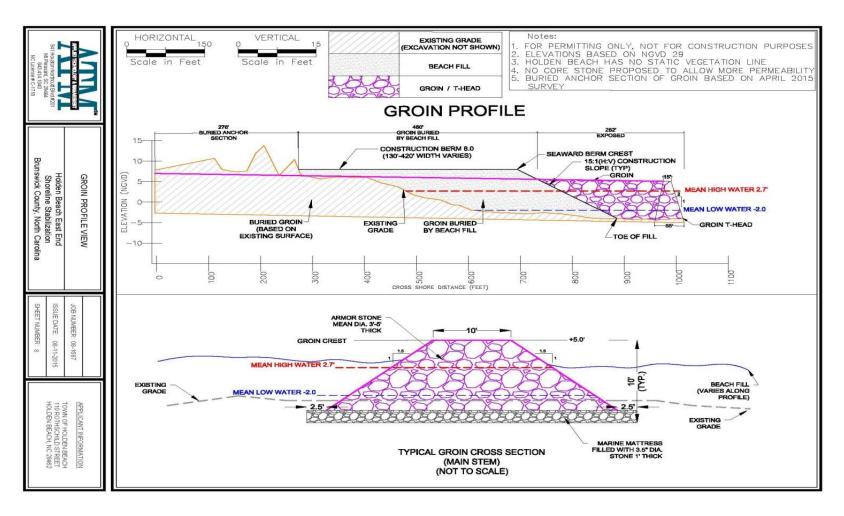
Alternative 5 – Short Groin Cross Section and Profile
